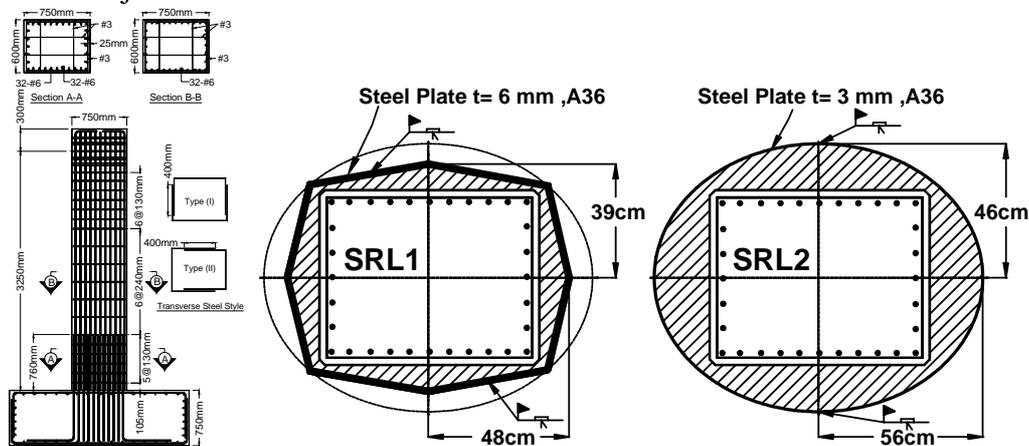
Details of Lap-splice specimen Figure 4. Details of the steel jackets for Lap-splice specimens
